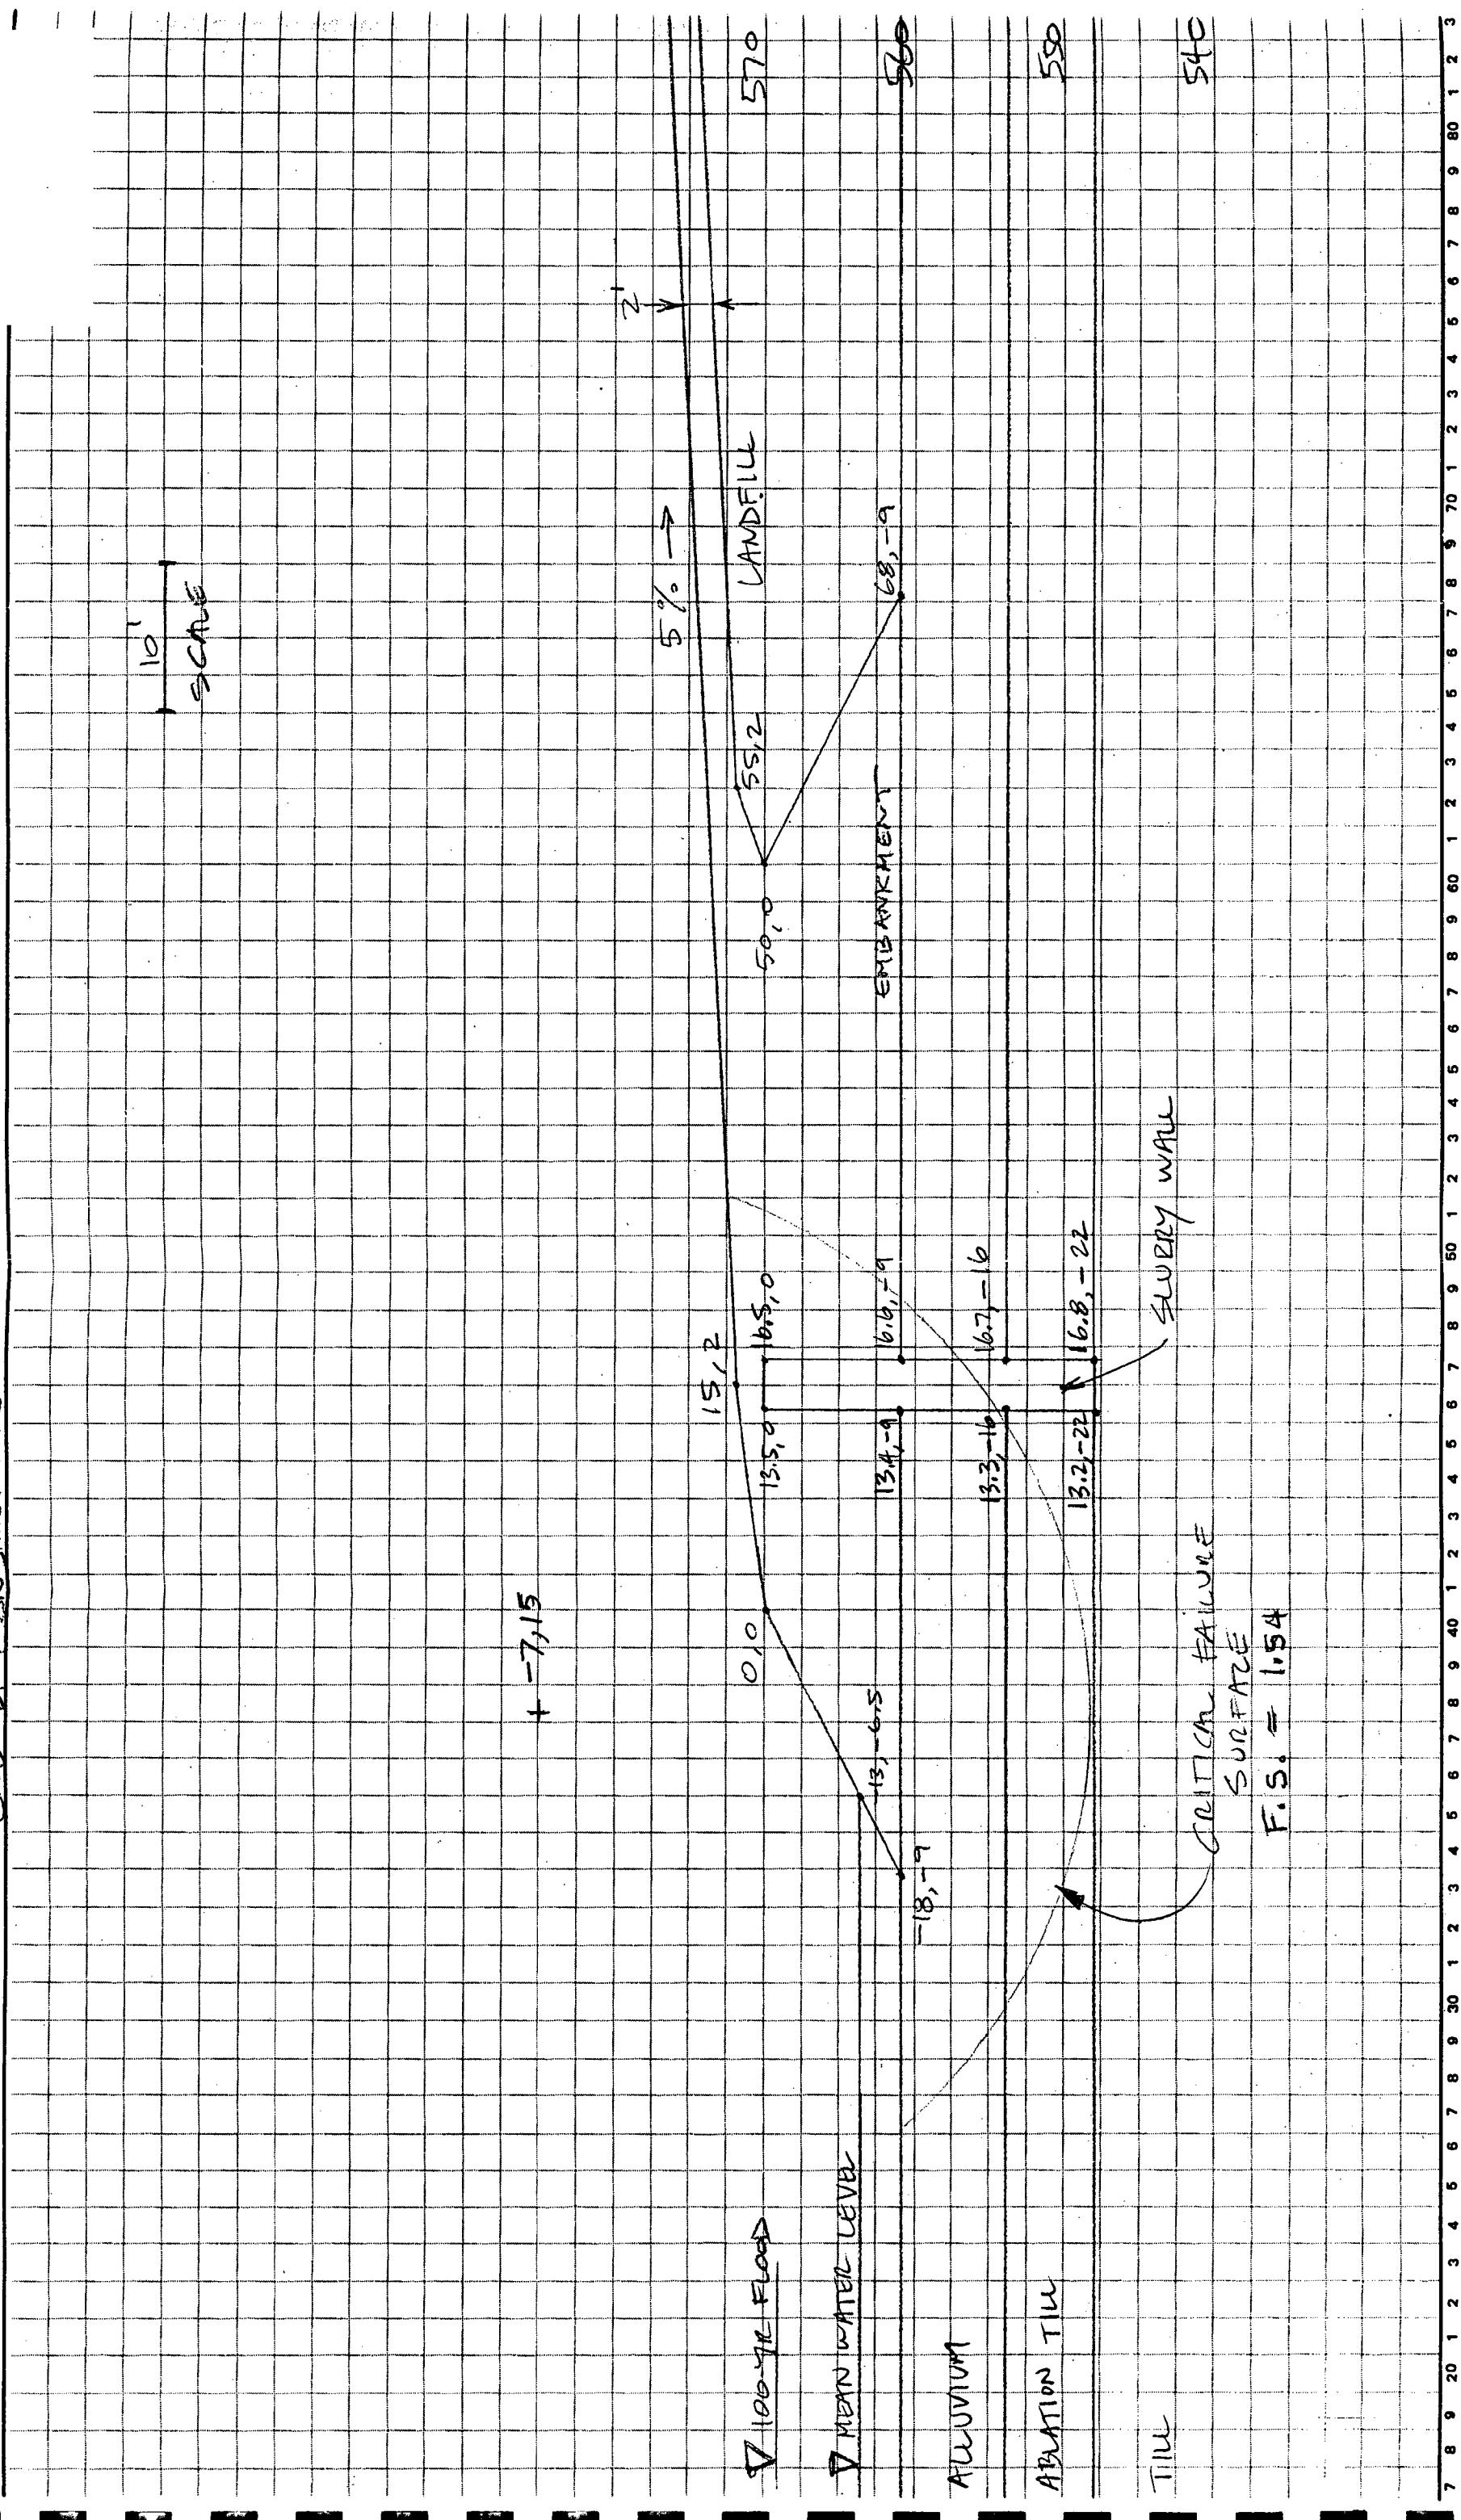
B BULLETPAD, WEST END OF OXYCOTEN PROPERTY, CROSS-SECTION NO. 3
